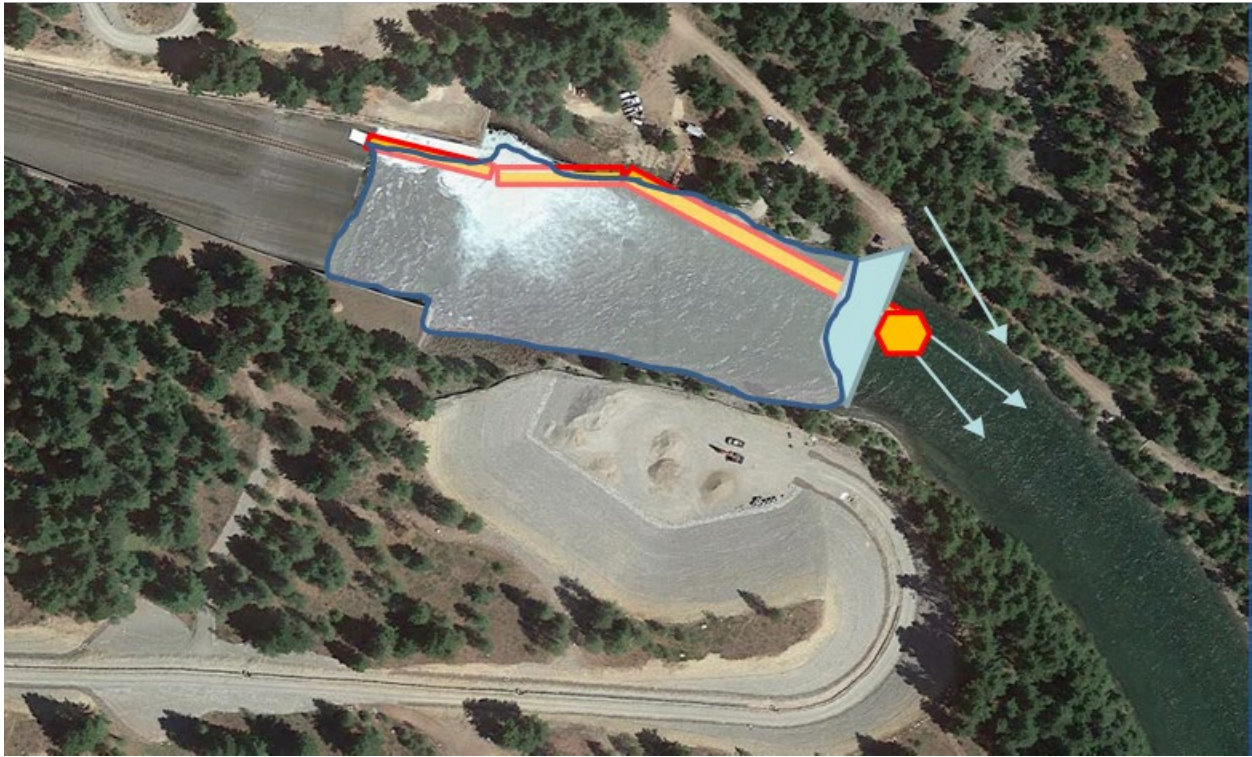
Outlet Works Diversion Conduit connected to dam outlet and discharging downstream of the channel-spanning cofferdam (Reclamation 2020, their Figure 18). The work area isolated from flowing water is located between Cle Elum Dam and the cofferdam and outlined in blue.
